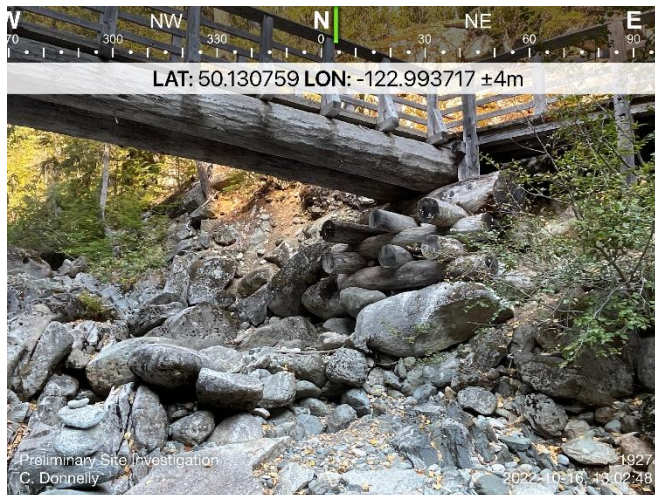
Existing bridge is supported on large boulders and timber cribbing.
